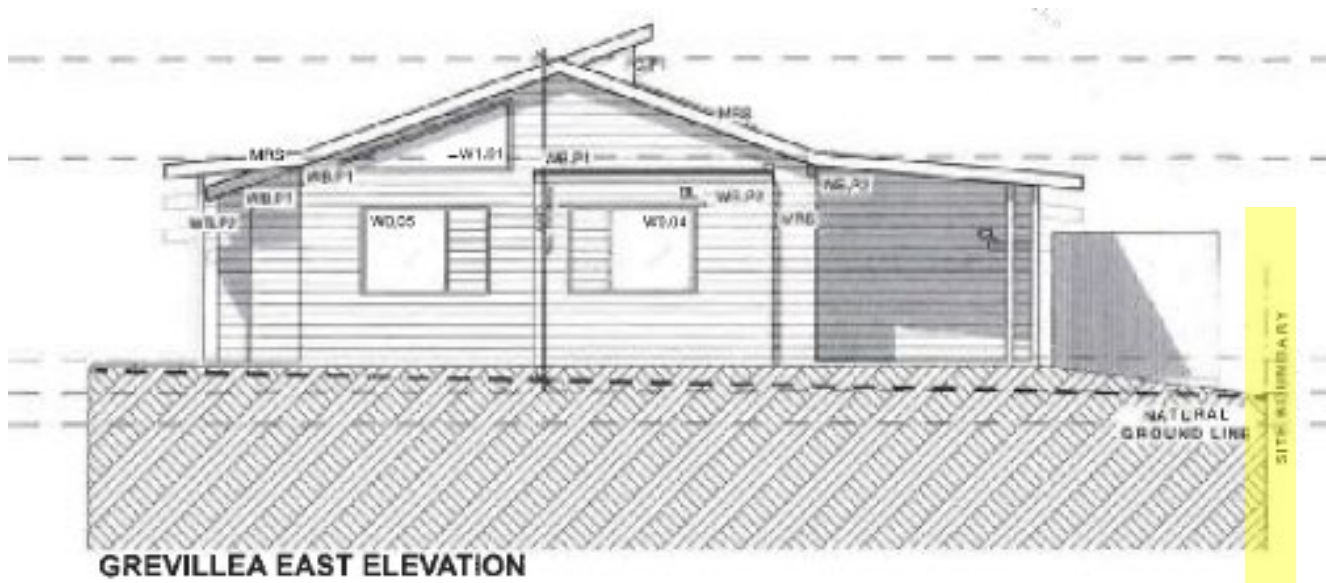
East elevation showing proposed change in finished ground levels that are returned to existing ground levels at the boundary (common boundary highlighted yellow) (source: DA2021/0226).
